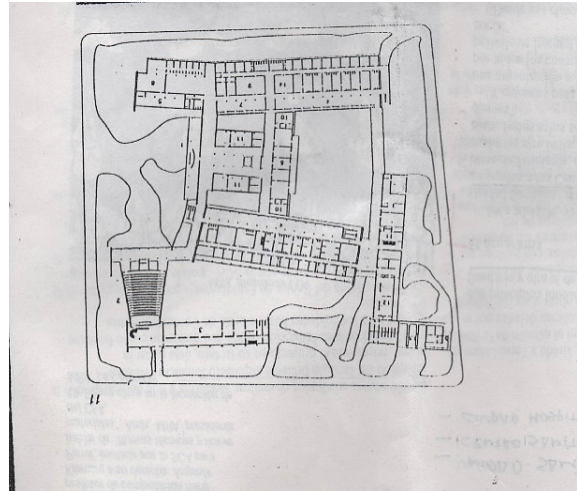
General floor plan. Source: Revista S.C.A. Arq. Juan Molina y Vedia.
